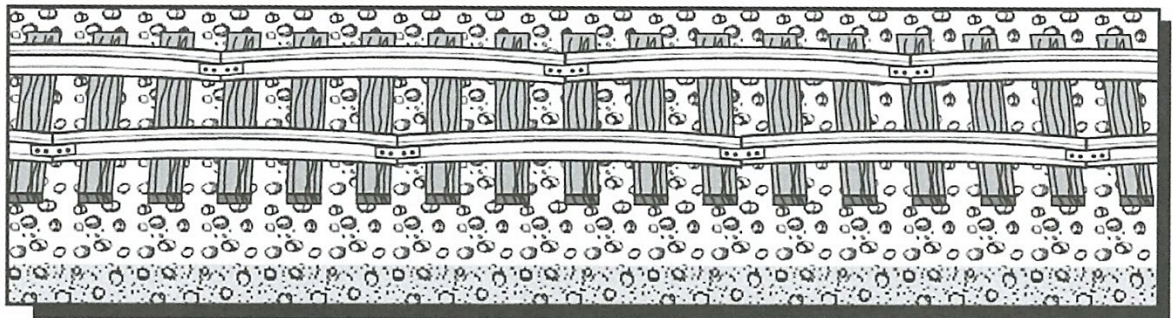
Figure SUB-PART C – 34 – Rock and Roll Surface Defect Example
